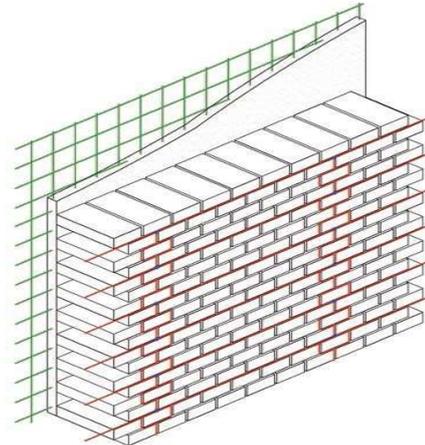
Example of the application of the reinforcement technique: the indoor façade could be reinforced with a more traditional steel-mesh jacketing or the proposed technique.
